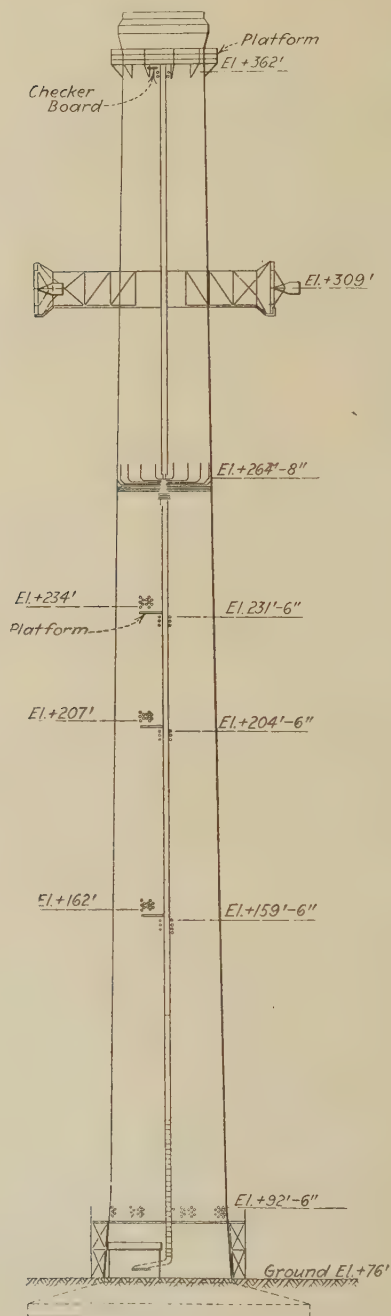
LOCATION OF THERMO-COUPLES, OUTRIGGERS, TUBES AND STRAIN-GAGE POINTS.
